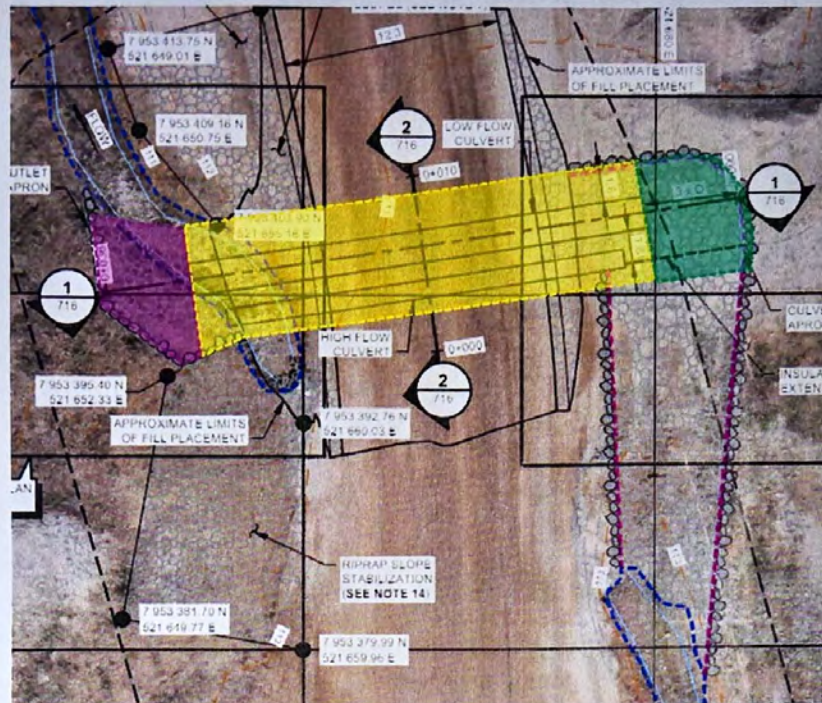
Approximate foundation acceptance area FND-01, plan view. Section 1 highlighted in yellow, Section 2 highlighted in green, Section 3 highlighted in purple.
